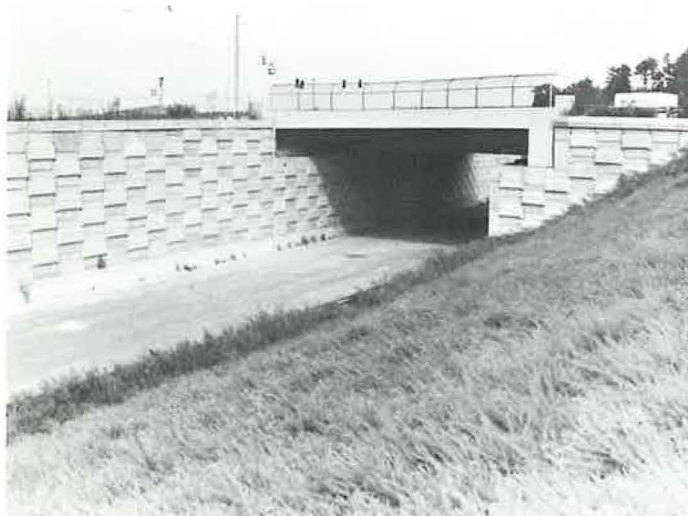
VSL wall supporting MARTA rail line over Piedmont Avenue, Atlanta.
